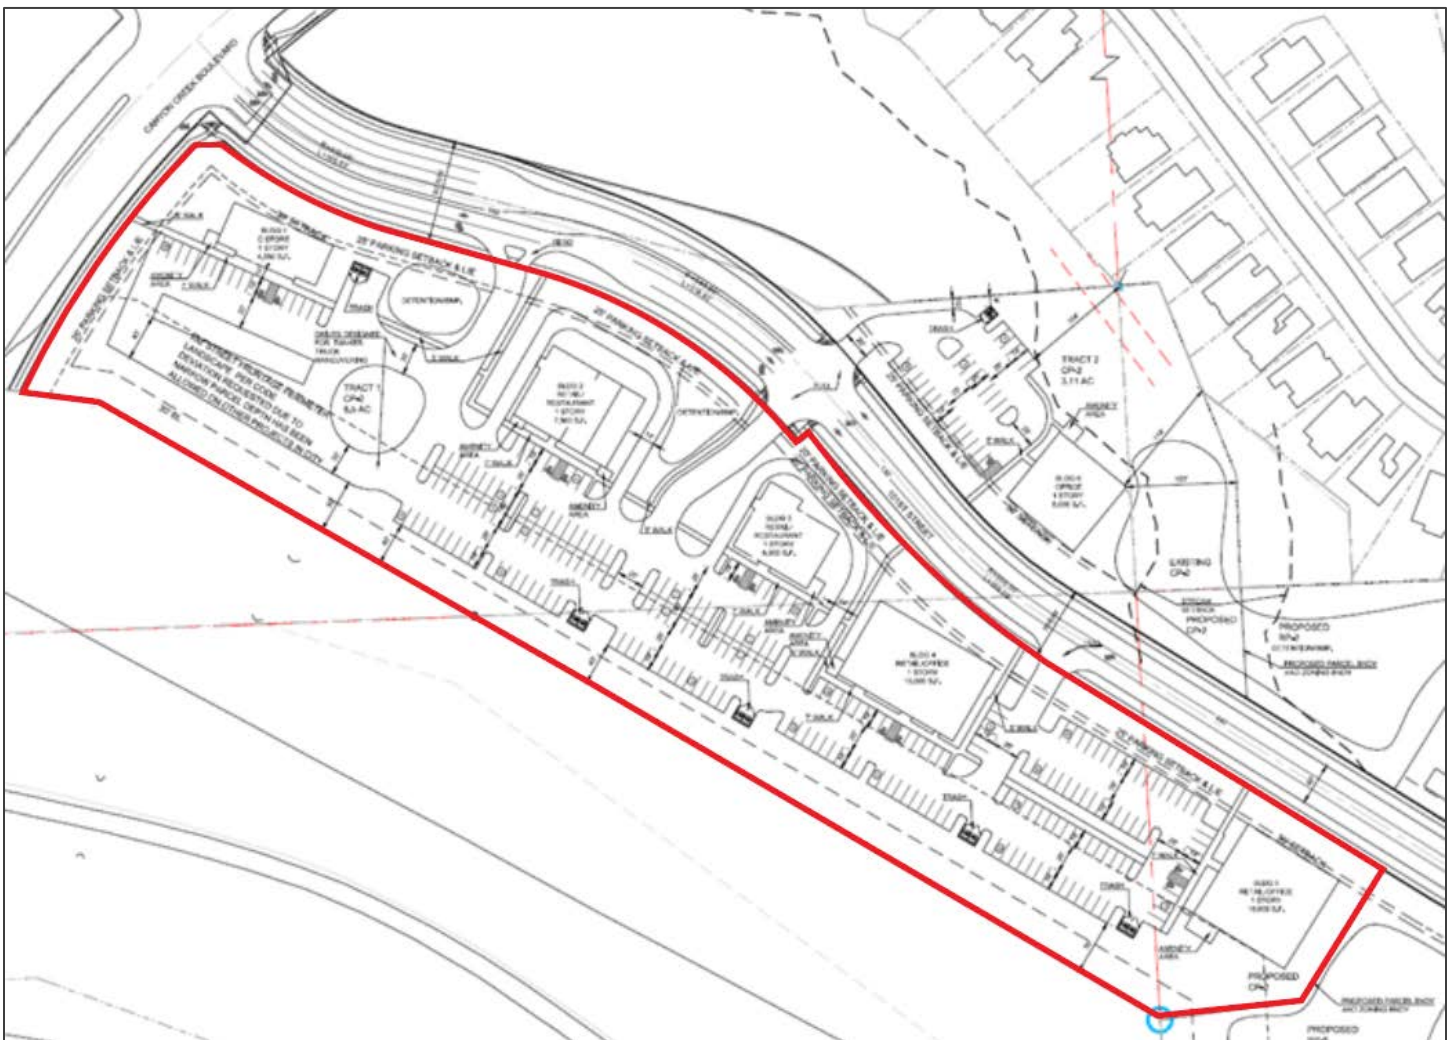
, Tract 1 – Commercial Center Concept Plan.
